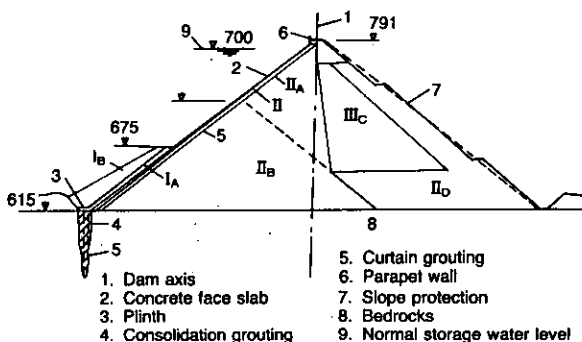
A cross section of the Tianshengqiao I concrete face rockfill dam
